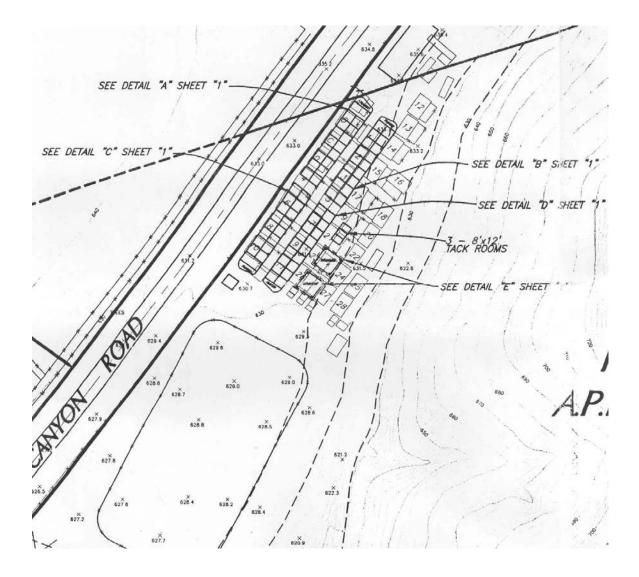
CDPA No. 4-02-131 Site Plan (Proposed)
